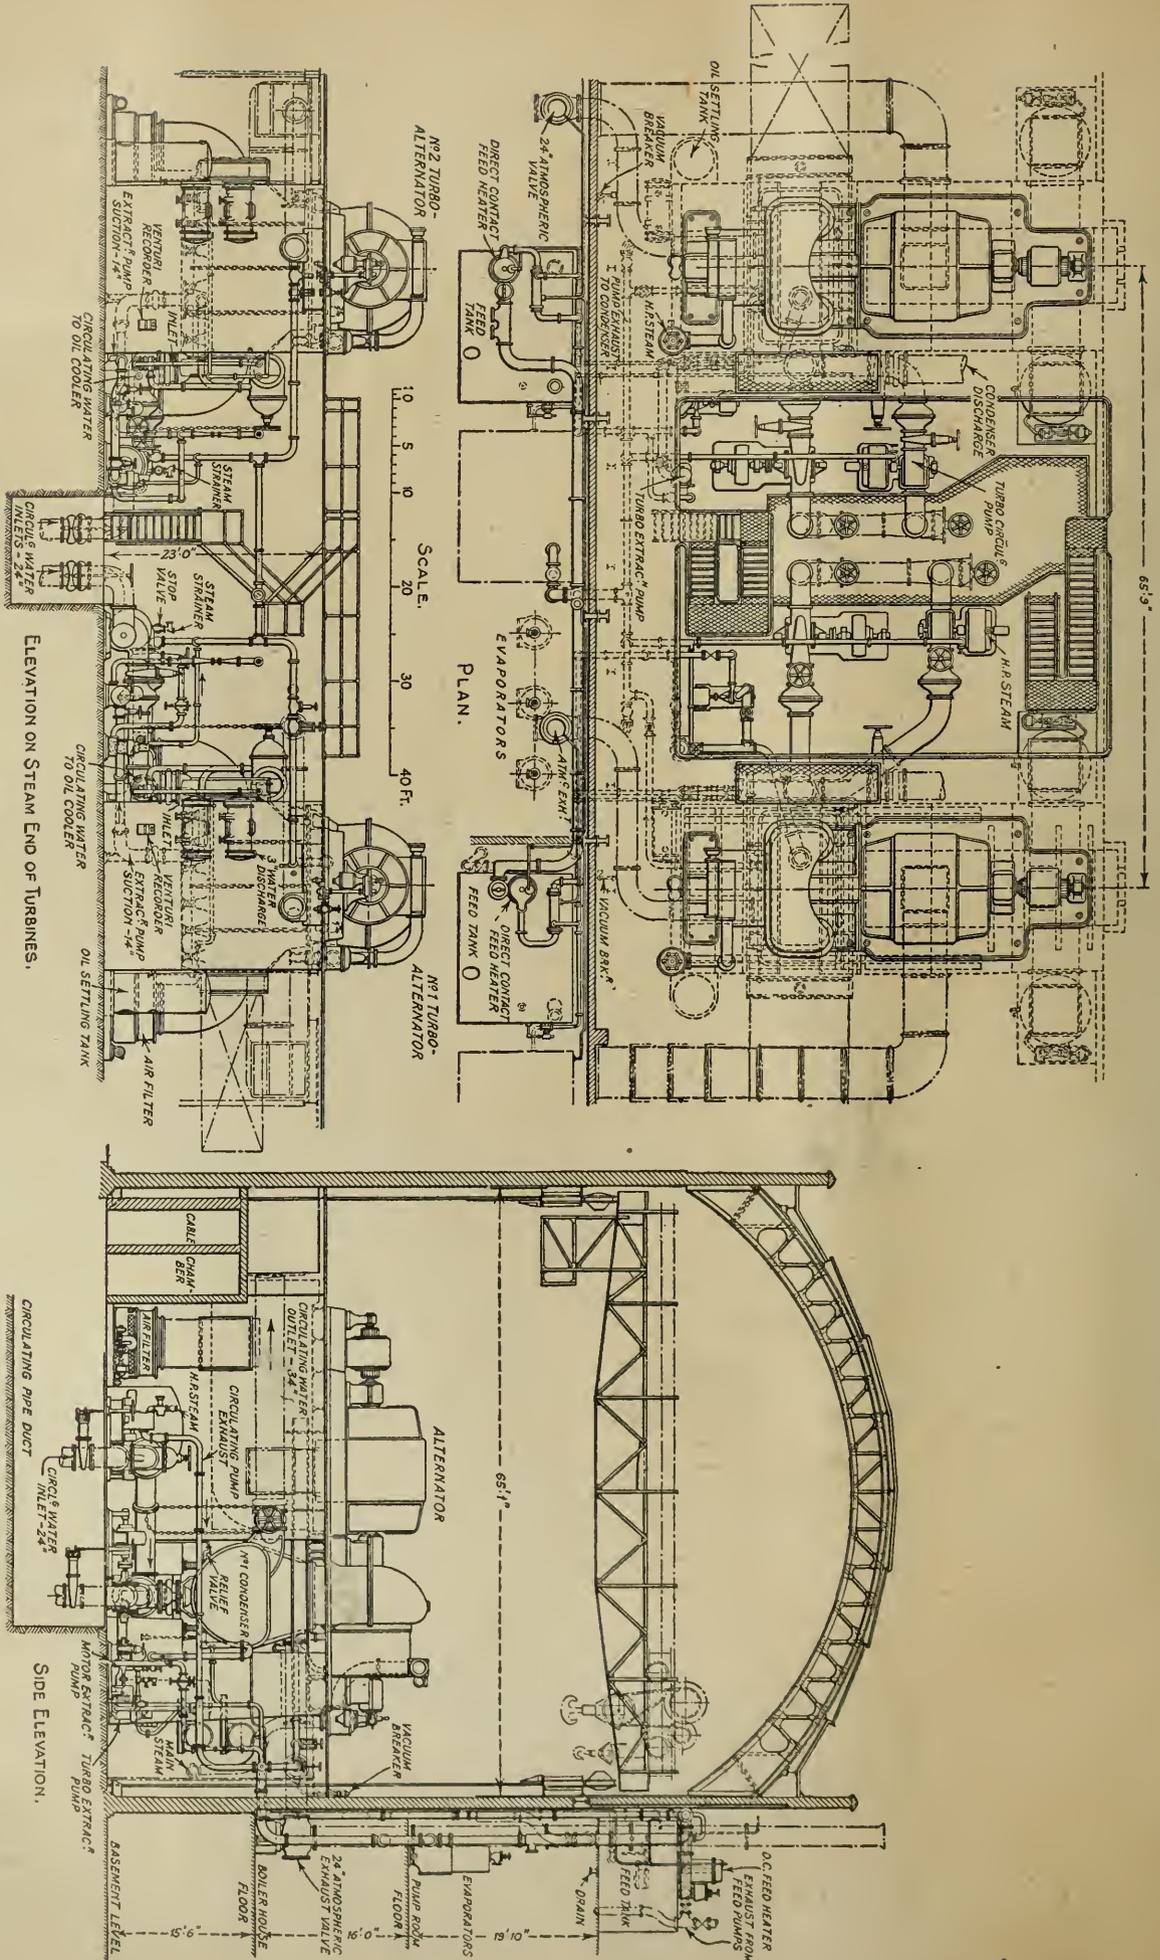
PLAN AND ELEVATIONS SHOWING GENERAL ARRANGEMENT OF TURBO-ALTERNATORS, CONDENSING PLANT, PUMPS, ETC., AT NECHELLS.
